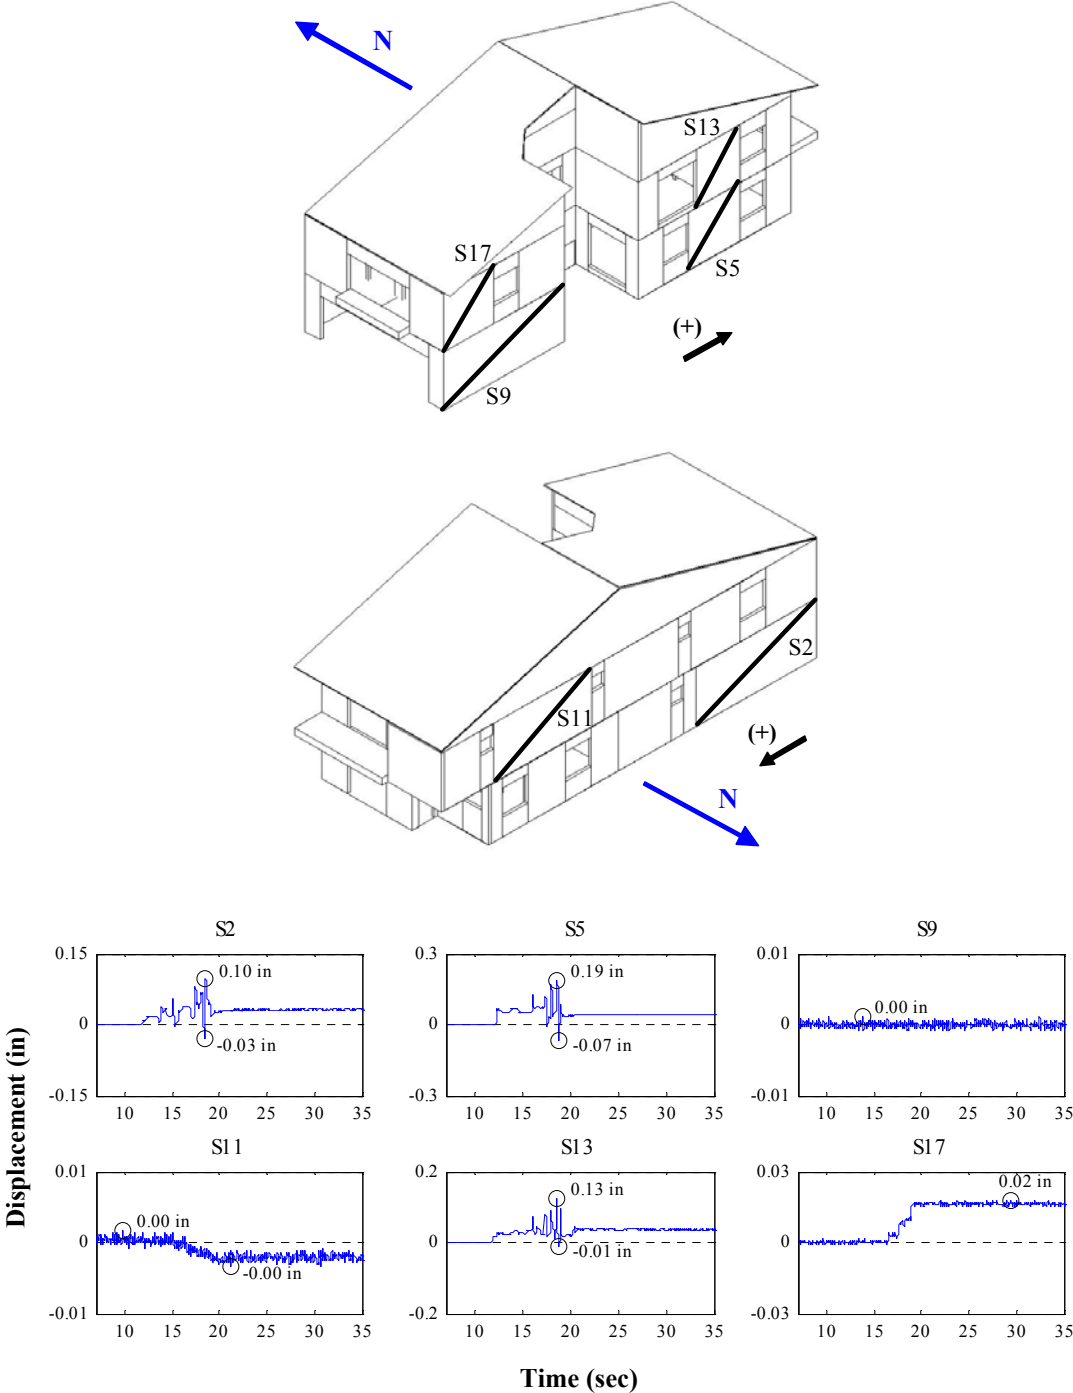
Wall deformations of east-west external walls for Test NWP3S04
